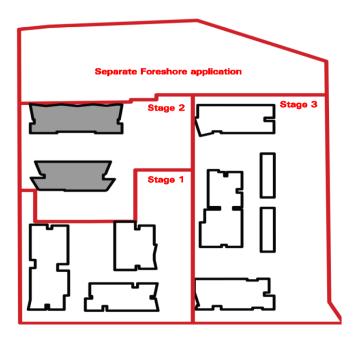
Indicative Staging Plan (source: Applicants SEE)
